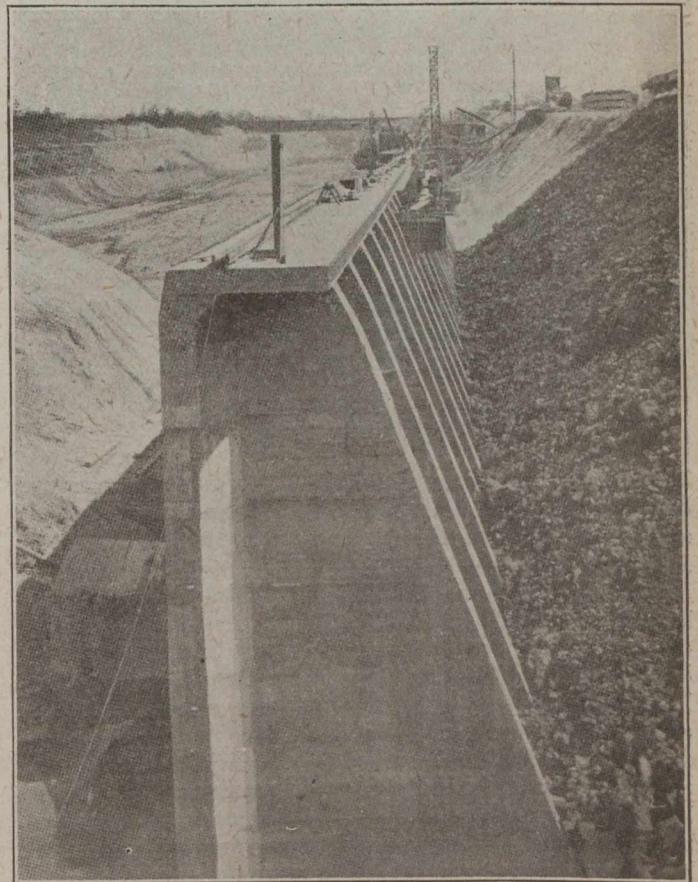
Reinforced Concrete Wall, Lock No. 1 being Backfilled
